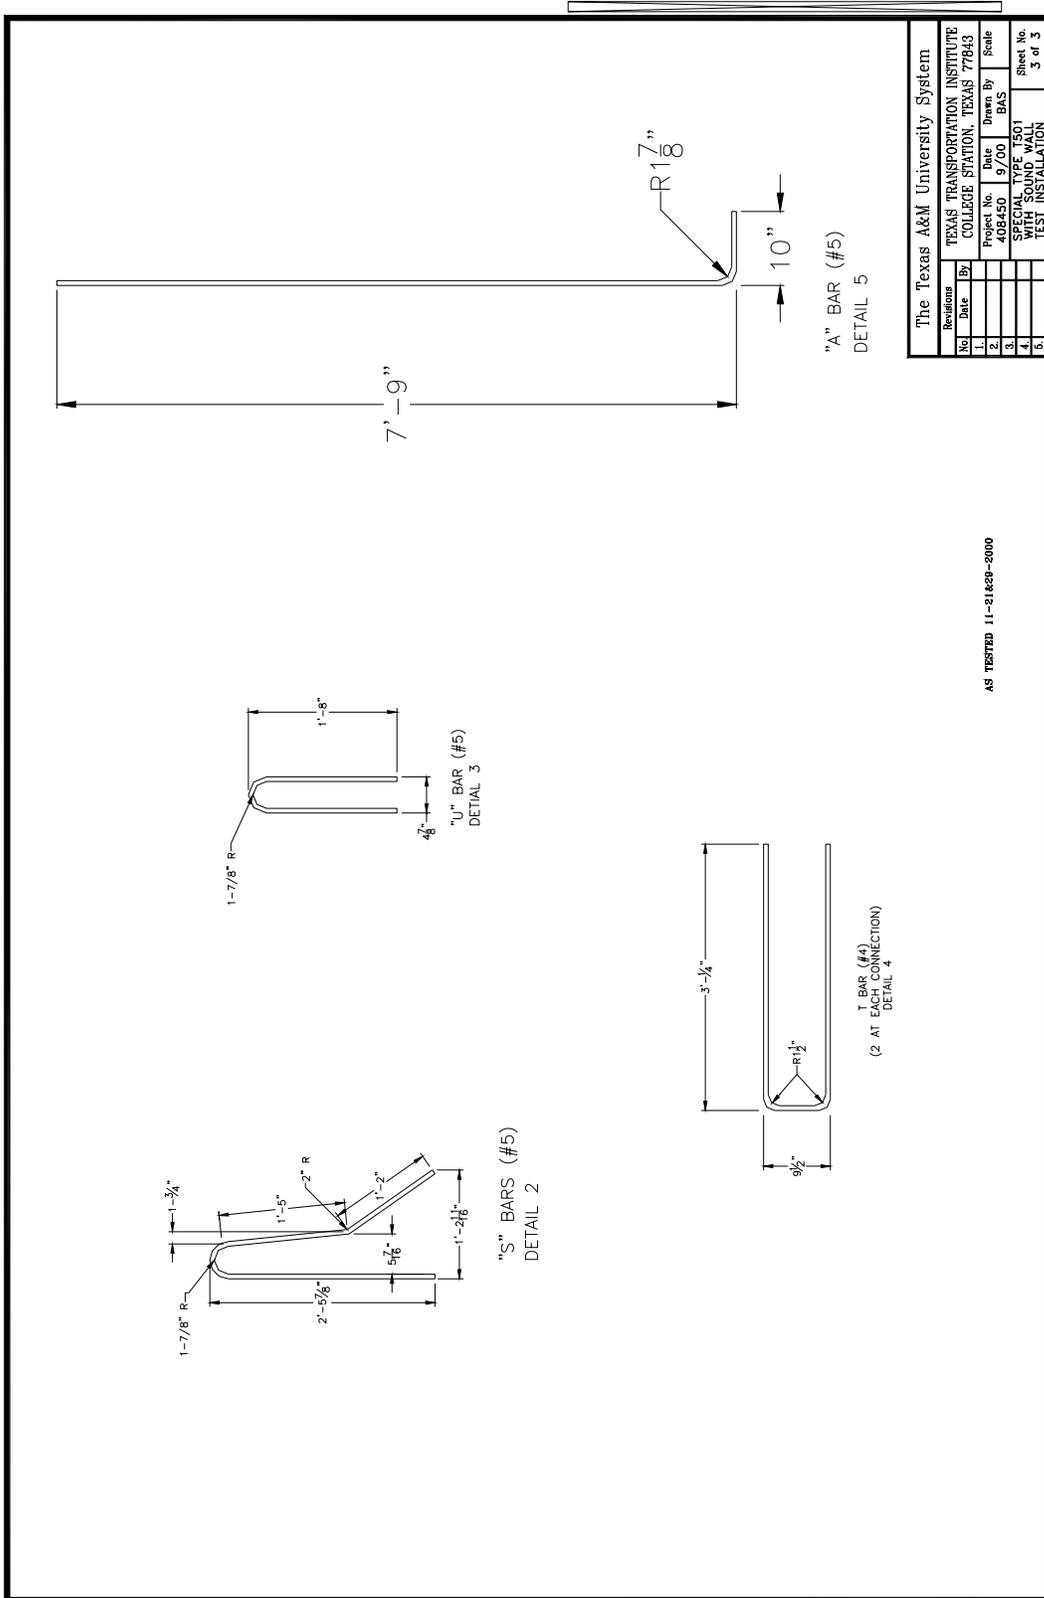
Details of the T501 Bridge Rail with Soundwall (continued).
